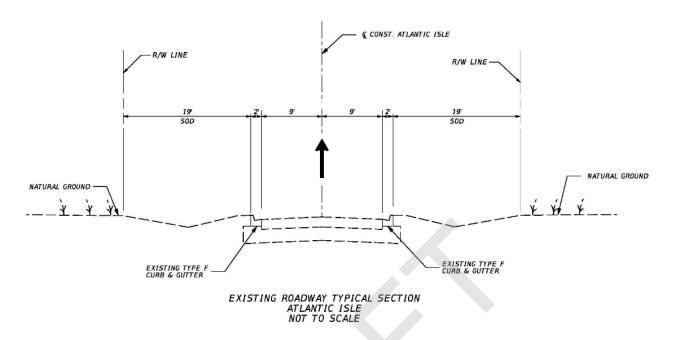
Existing Atlantic Isles Roadway Typical Section
